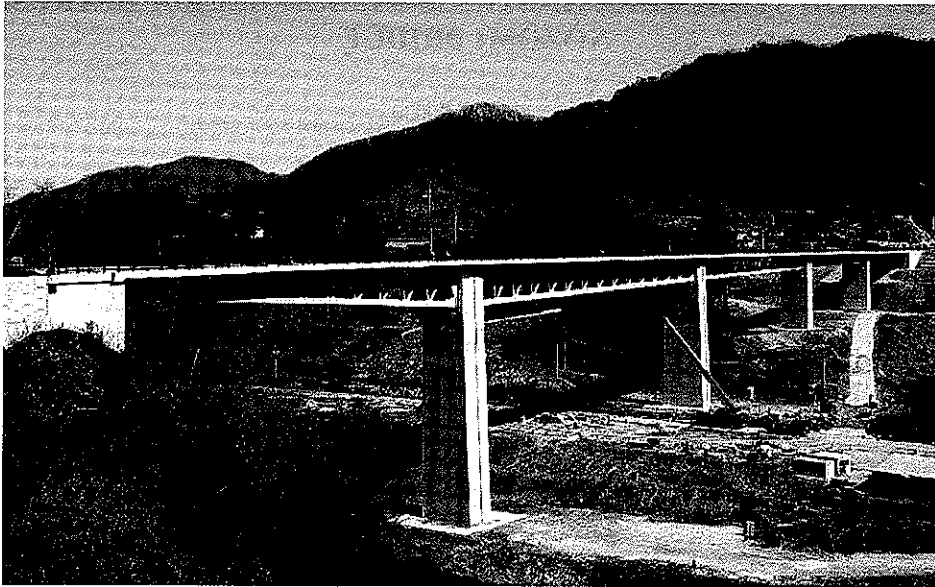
the completed bridge SHITSUMI-OHASHU Bridge
